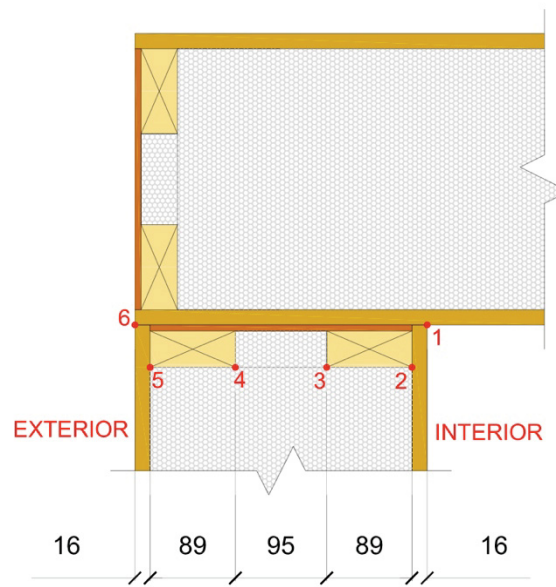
Sensor placement for joint types F, J, and L (dimensions in mm)
